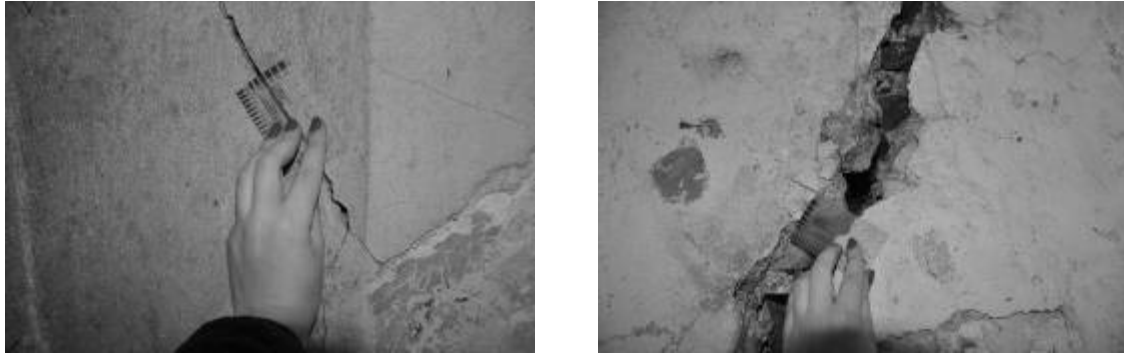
Results of the structure opening to determine the technical state of foundations under the pillars
